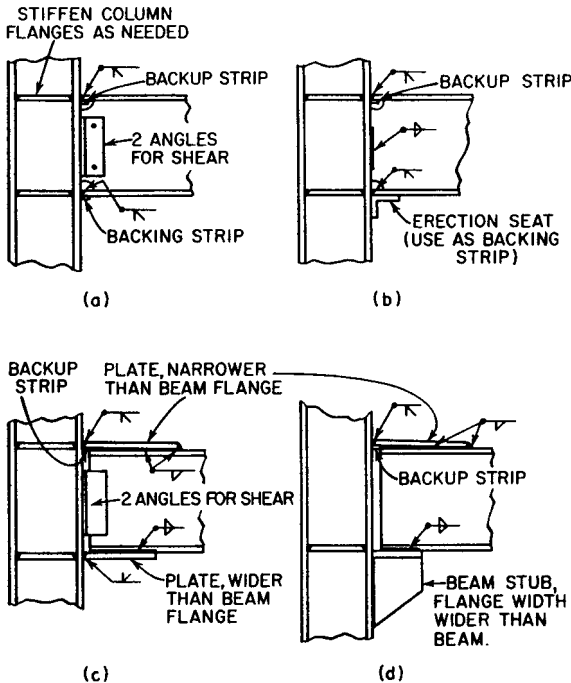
Methods of constructing welded rigid connections.
